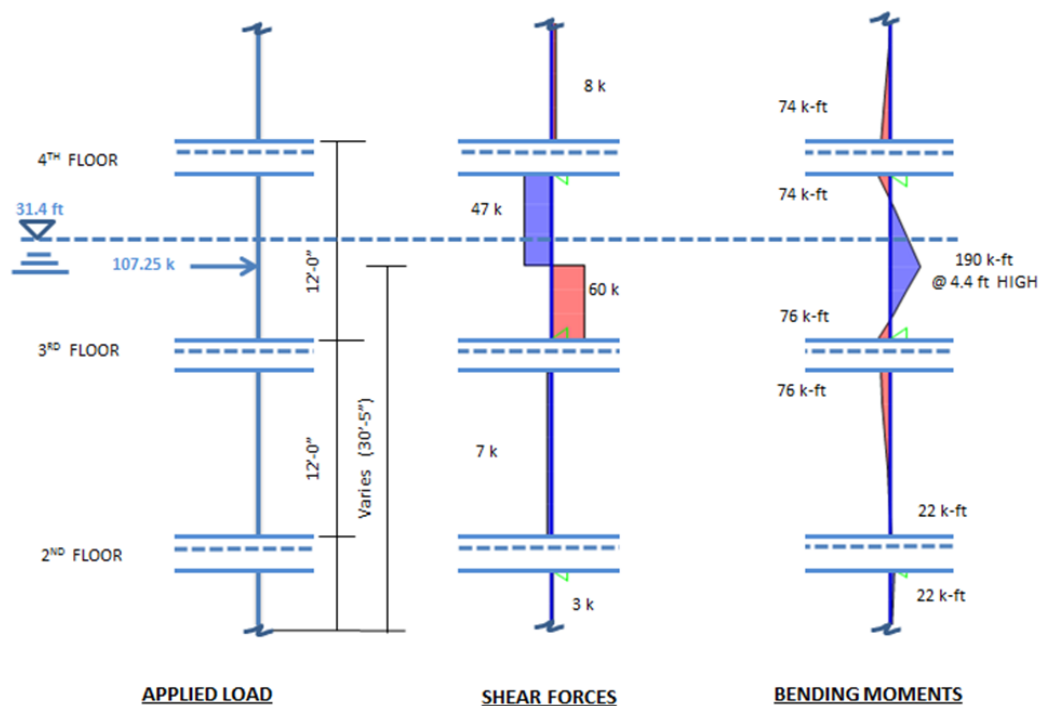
Impact load applied at " $d + h_c$ " away from the end of column on the 3rd floor
